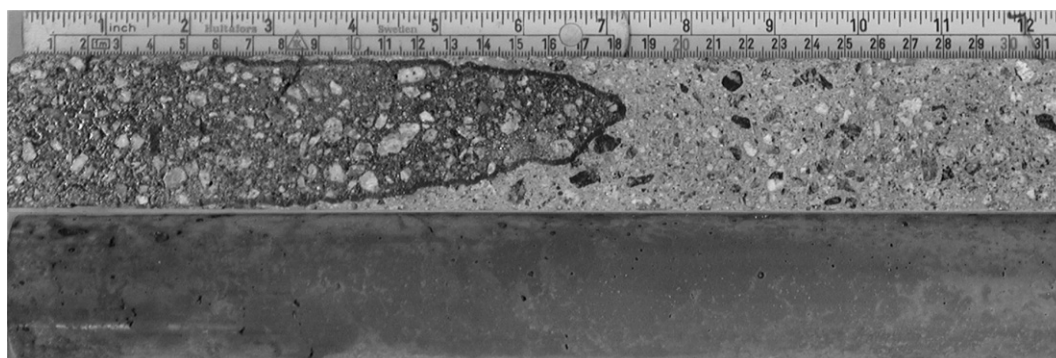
Flow profiles (upper) and pipe wall surface (lower) Mix 3 – acryl, $v = 0.3$ m/s. The hardened sample from Mix 3–steel pipe–was damaged and not fit for further testing.
